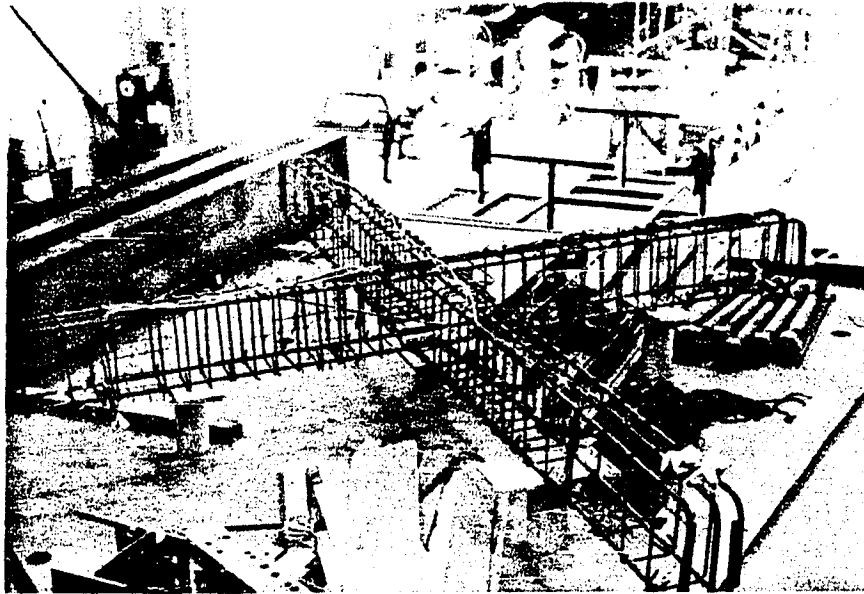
Beam reinforcement cage, interior prototype specimen
